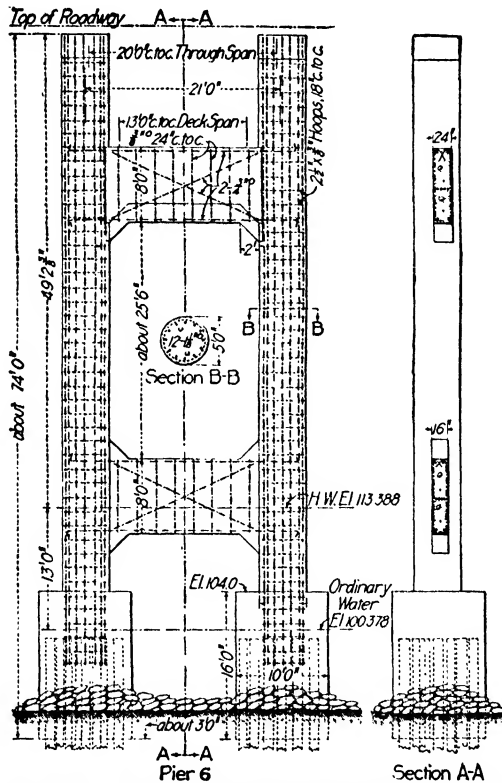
Reinforced-concrete Double-cylinder Pier.
